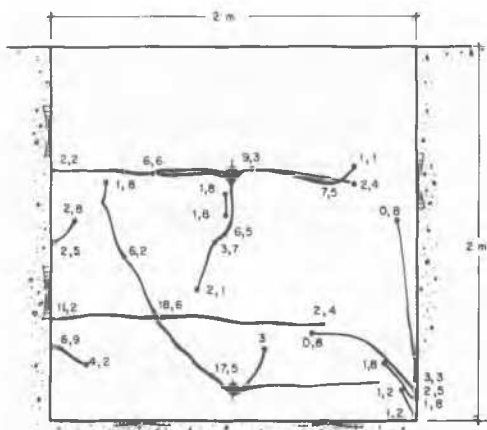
Distribution of Grout, Vertical Wall of Test Pit. (Numbers indicate grout thickness in mm.)
